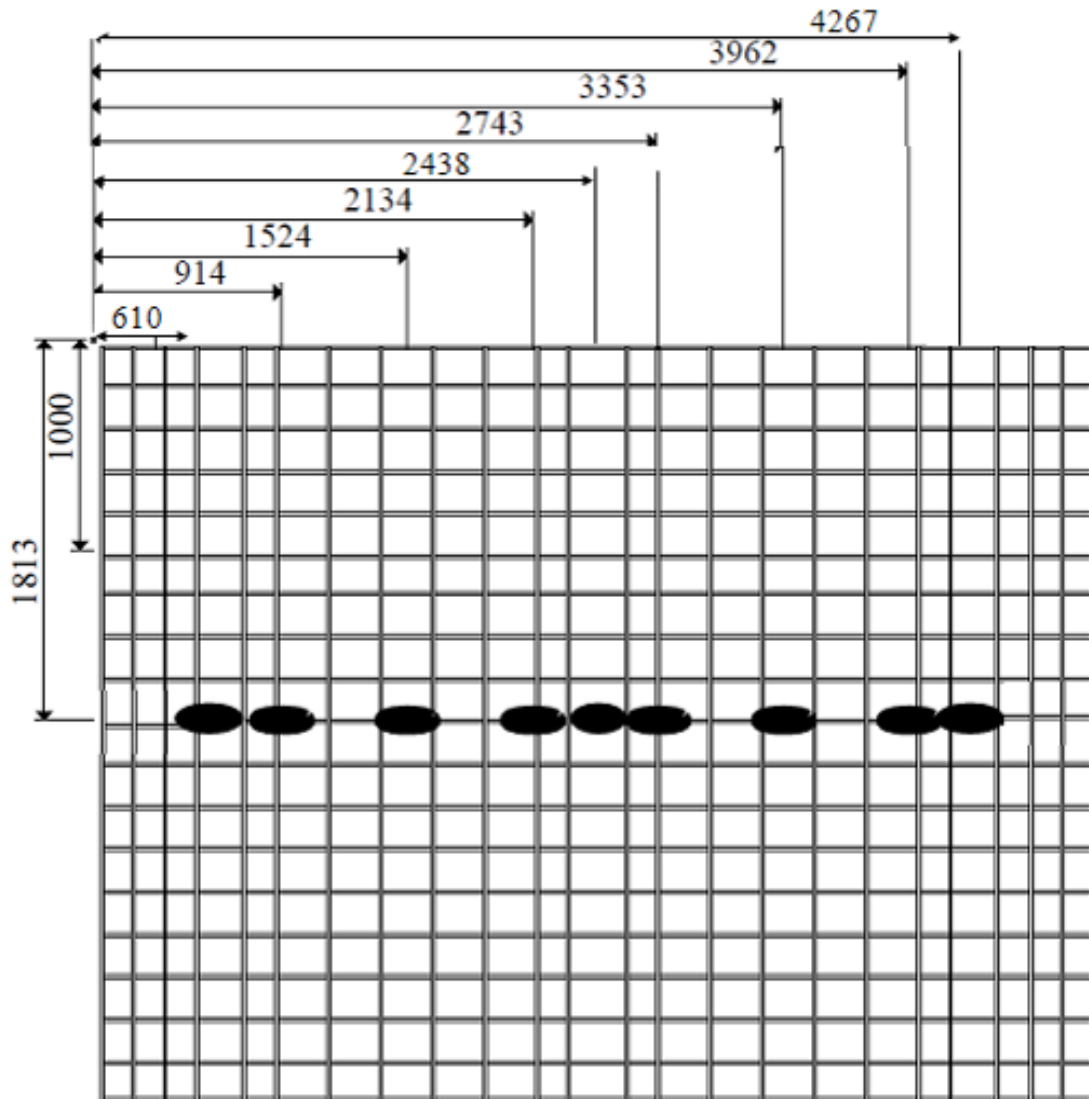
Layout of strain gages attached to top transverse steel reinforcement
